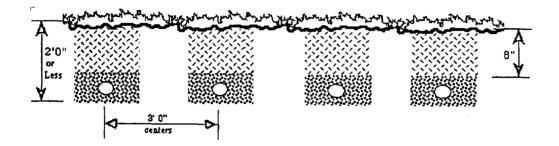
Shallow trench section view (www.greenbuilder.com)
